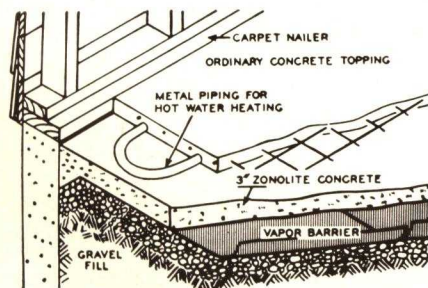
Zonolite Insulating Concrete as base for radiant heating coils.
